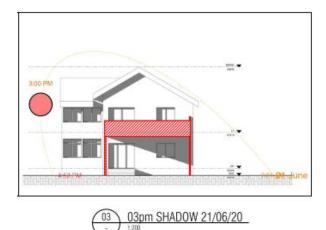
South-West elevation shadow diagram depicting the extent of shadowing effecting the bedroom window of the Unit 1/62 Osborne Road at 3pm on 21st June 2020. (Source: Drawn4U Building Design)
